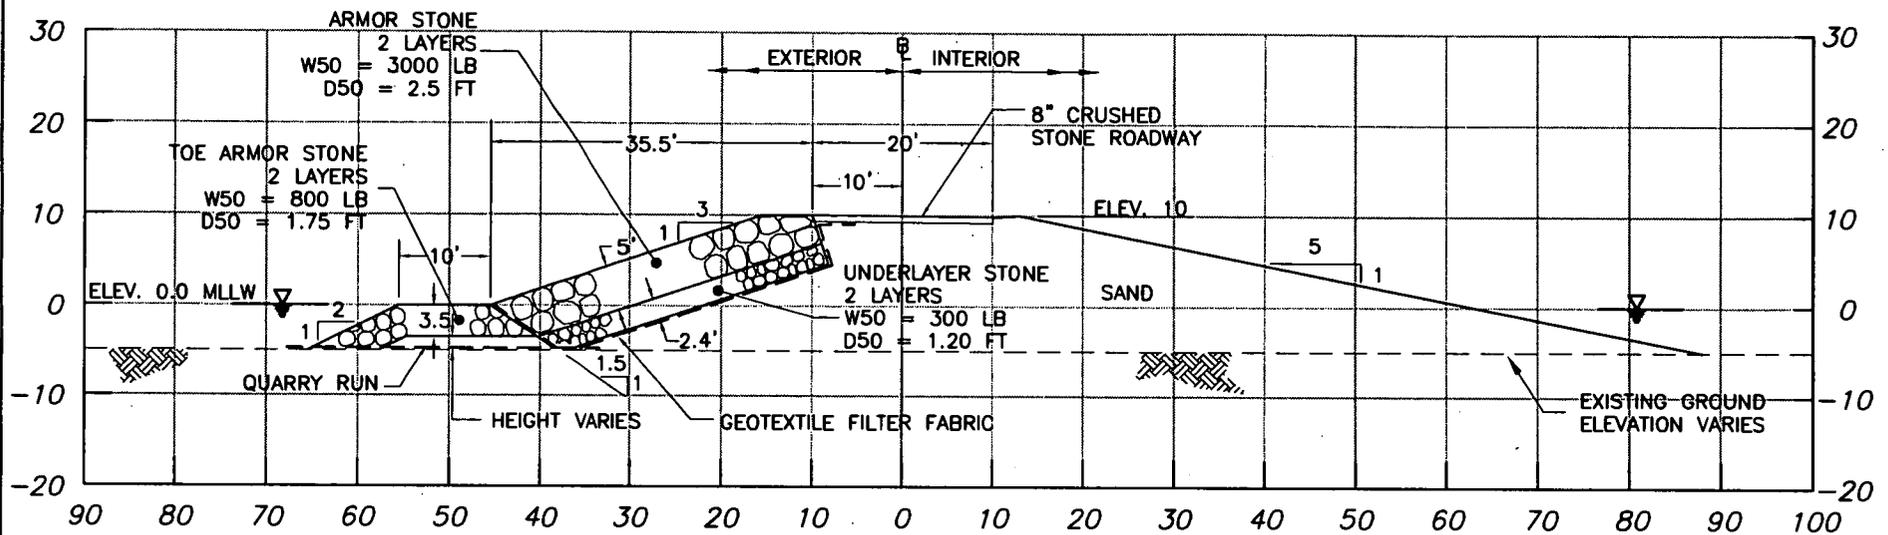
BARREN ISLAND TYPICAL DIKE SECTIONS
